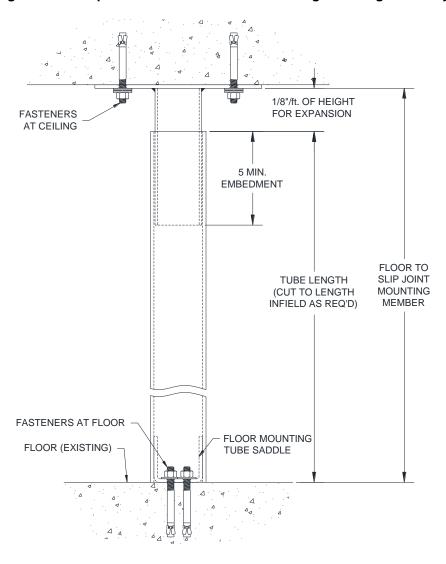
Slip Joint - Floor to Wall with Plate Mounting Assembly
